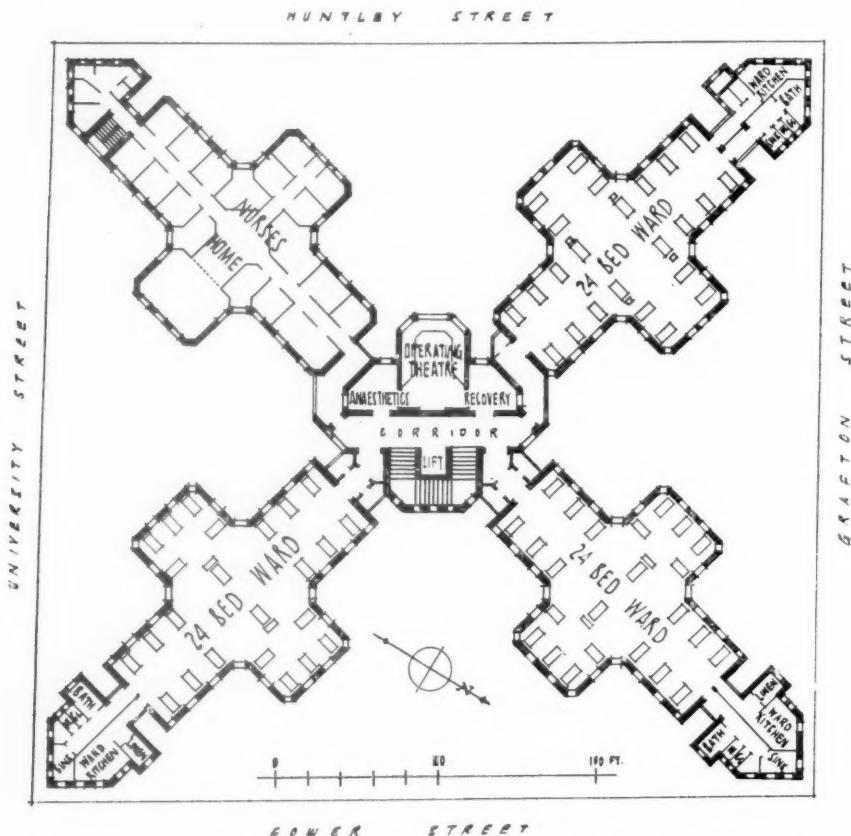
UNIVERSITY COLLEGE HOSPITAL, LONDON: FIRST FLOOR PLAN. (Architects Messrs. Alfred Waterhouse & Son.)
